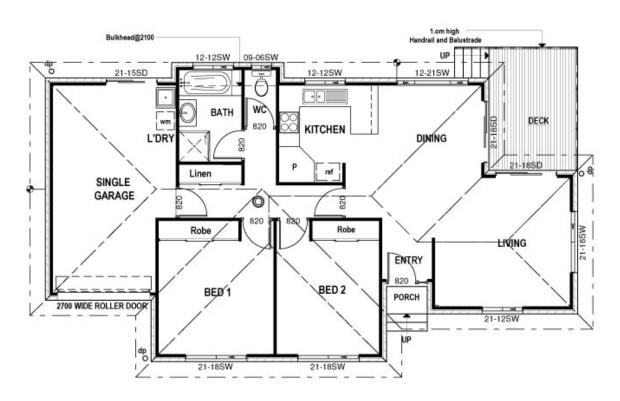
Floor plan of the concrete slab-on-ground floored test house (Source: Wilson Houses)
